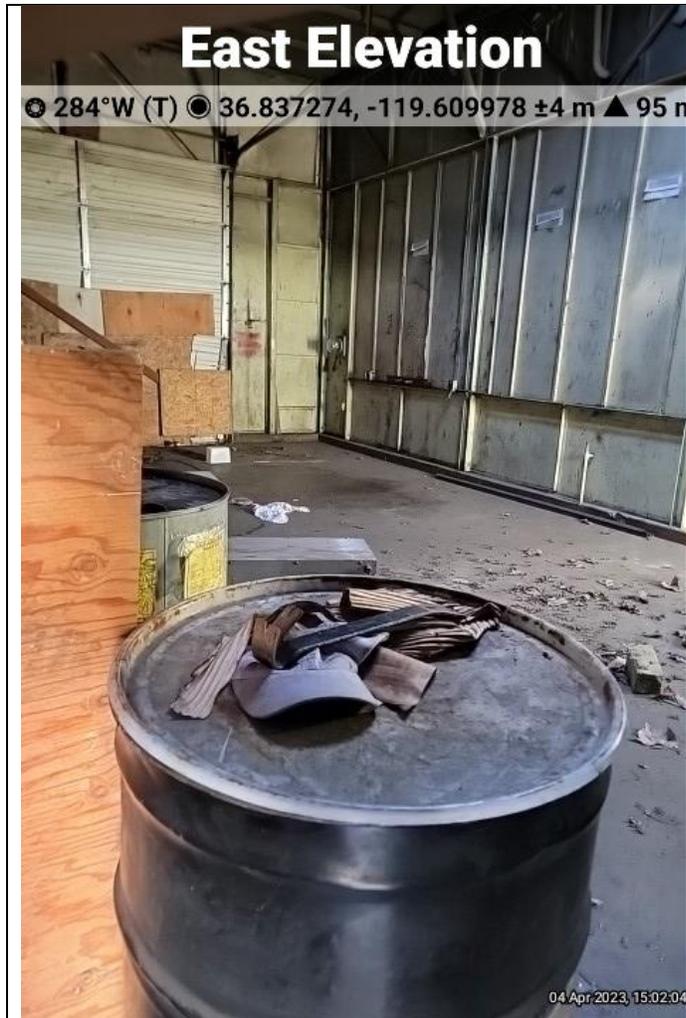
Personal items and used 55-gallon steel drum present in interior of building. View west.
